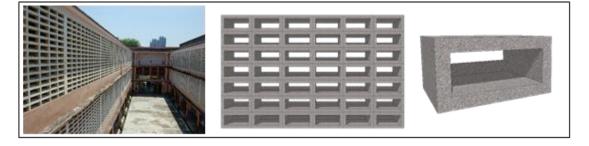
Stacks of rectangular shaped ventilation blocks creating a wall screen along the corridor of the school building
